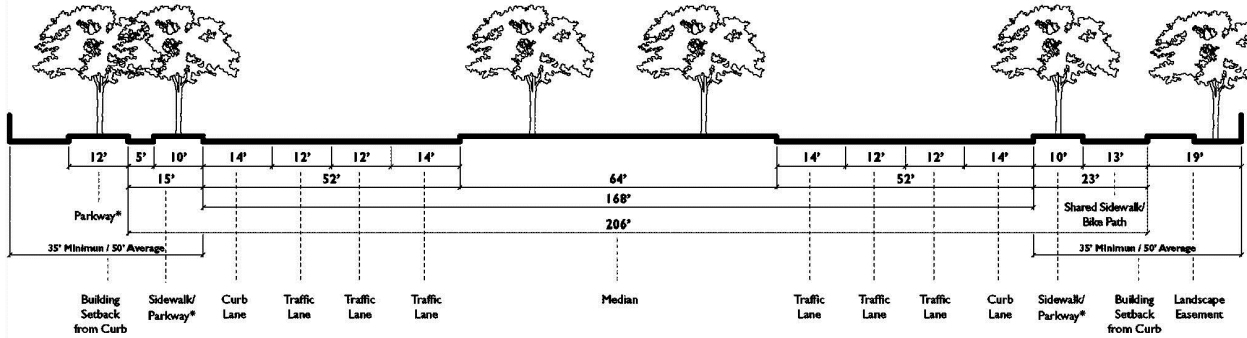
CITY OF CHINO GENERAL PLAN ROADWAY CROSS-SECTIONS (SHEET 3 OF 3)
